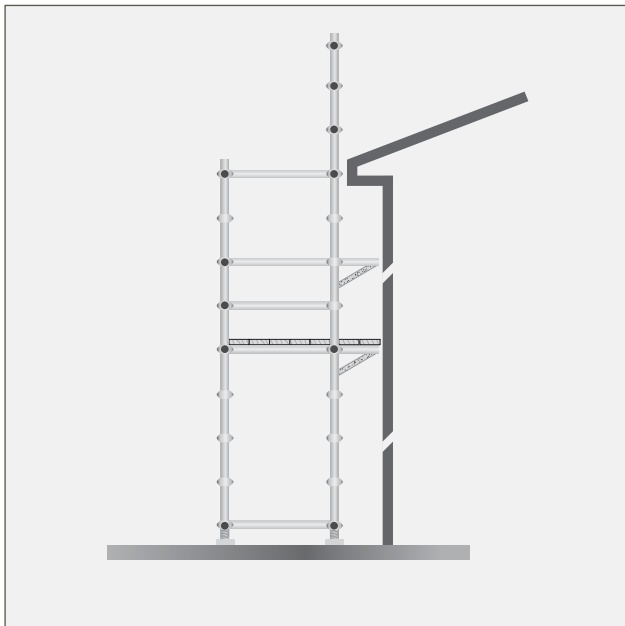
(e) Inside standards supporting guardrailing with hop-up bracket for other trades.
